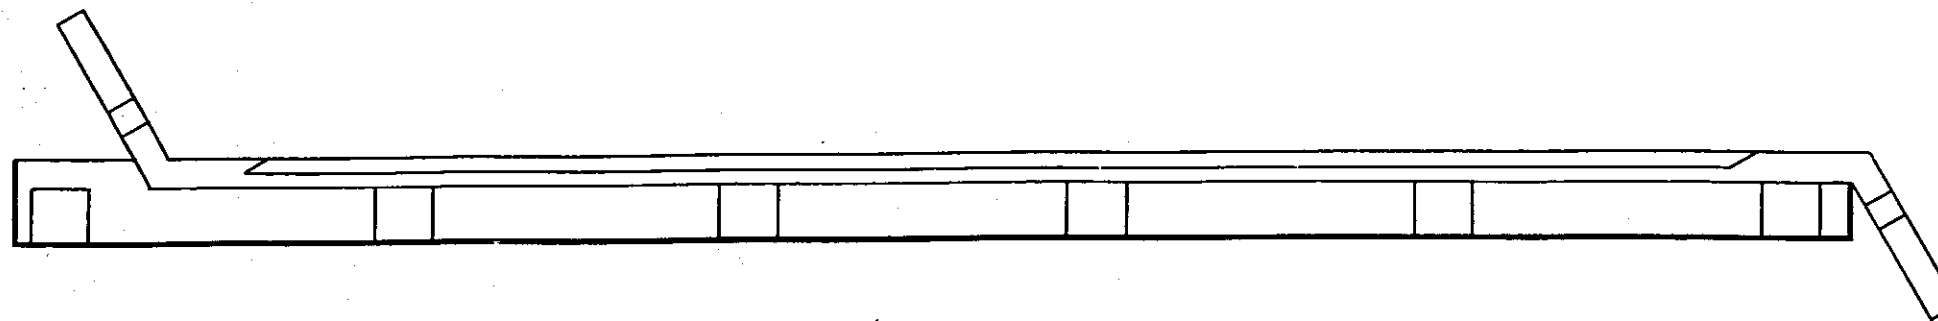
" x 18" REINFORCED CONCRETE PILE
